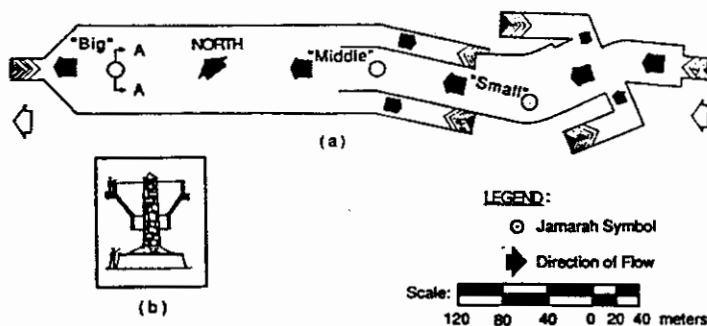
The Jamarat system: (a) plan view, (b) section A-A.
